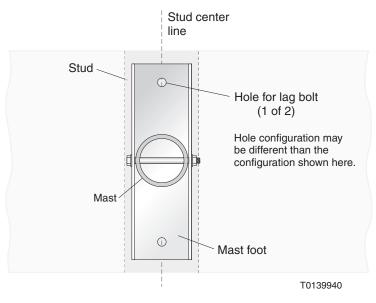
Aligning the mast foot on the stud center line (wood wall)
